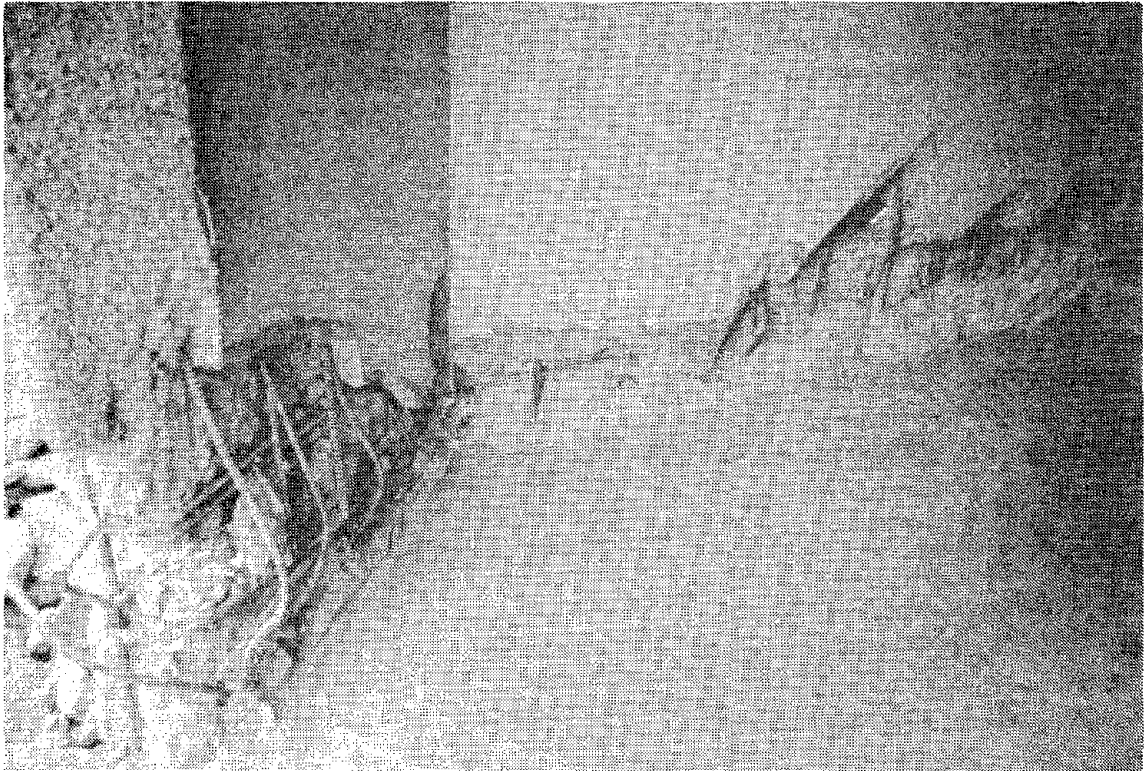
Damage to a reinforced concrete structural wall
